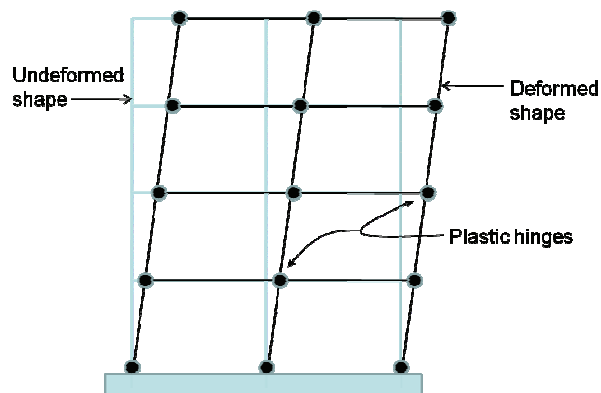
Sidesway mechanism controlled by panel-zone yielding.
